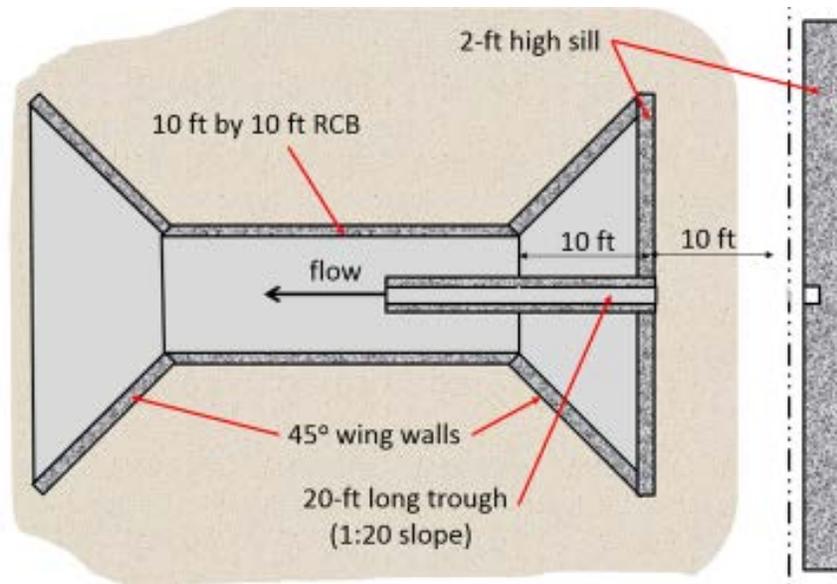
Alternative Model with Square Notch Slope Ramp
